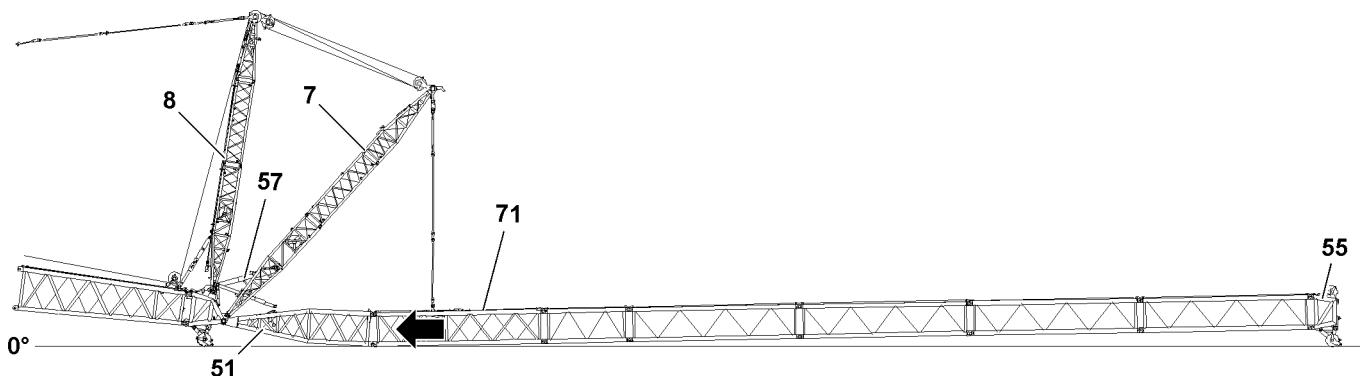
Assemble the W-lattice jib on the W-pivot section
